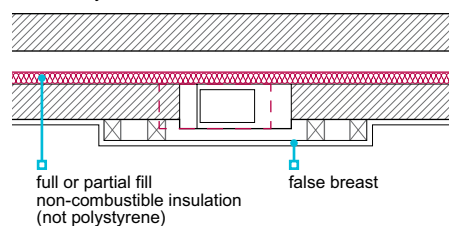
Precast flue blocks — false chimney breast arrangement with insulated cavity wall
